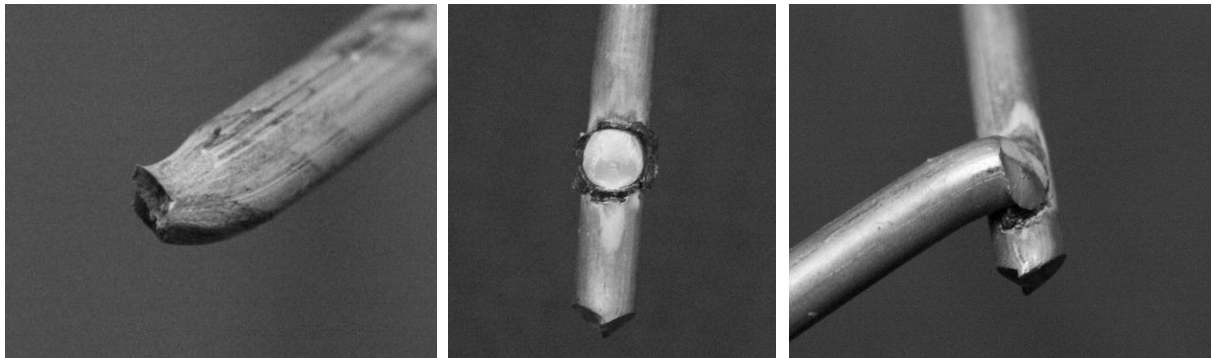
Welded wire failure modes; from left to right - tensile wire failure, shear weld failure and failure of the wire through the HAZ (Morton, et al., 2008)
